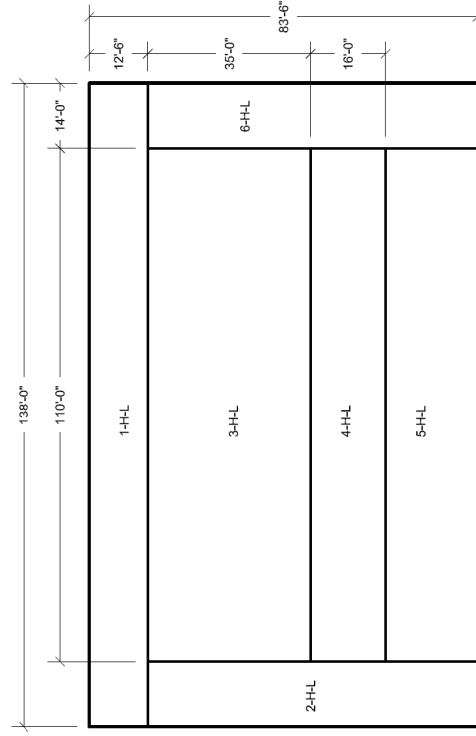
H.6-94: UHS BASIN EAST WALL LOOKING WEST
